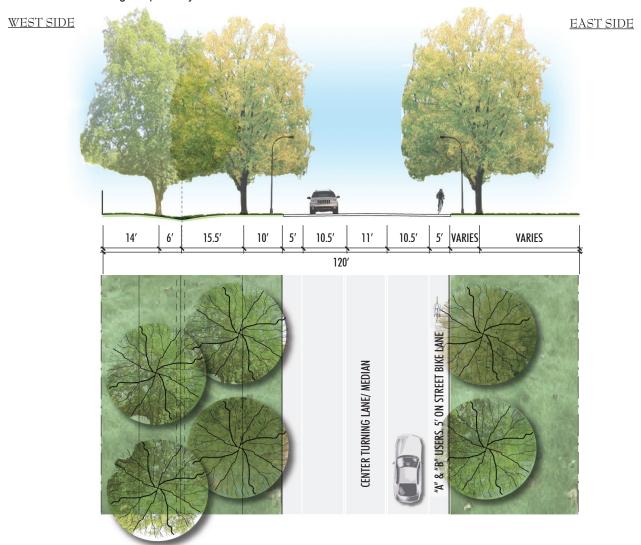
Southwestern Parkway: Zone 3 Existing Section & Plan
